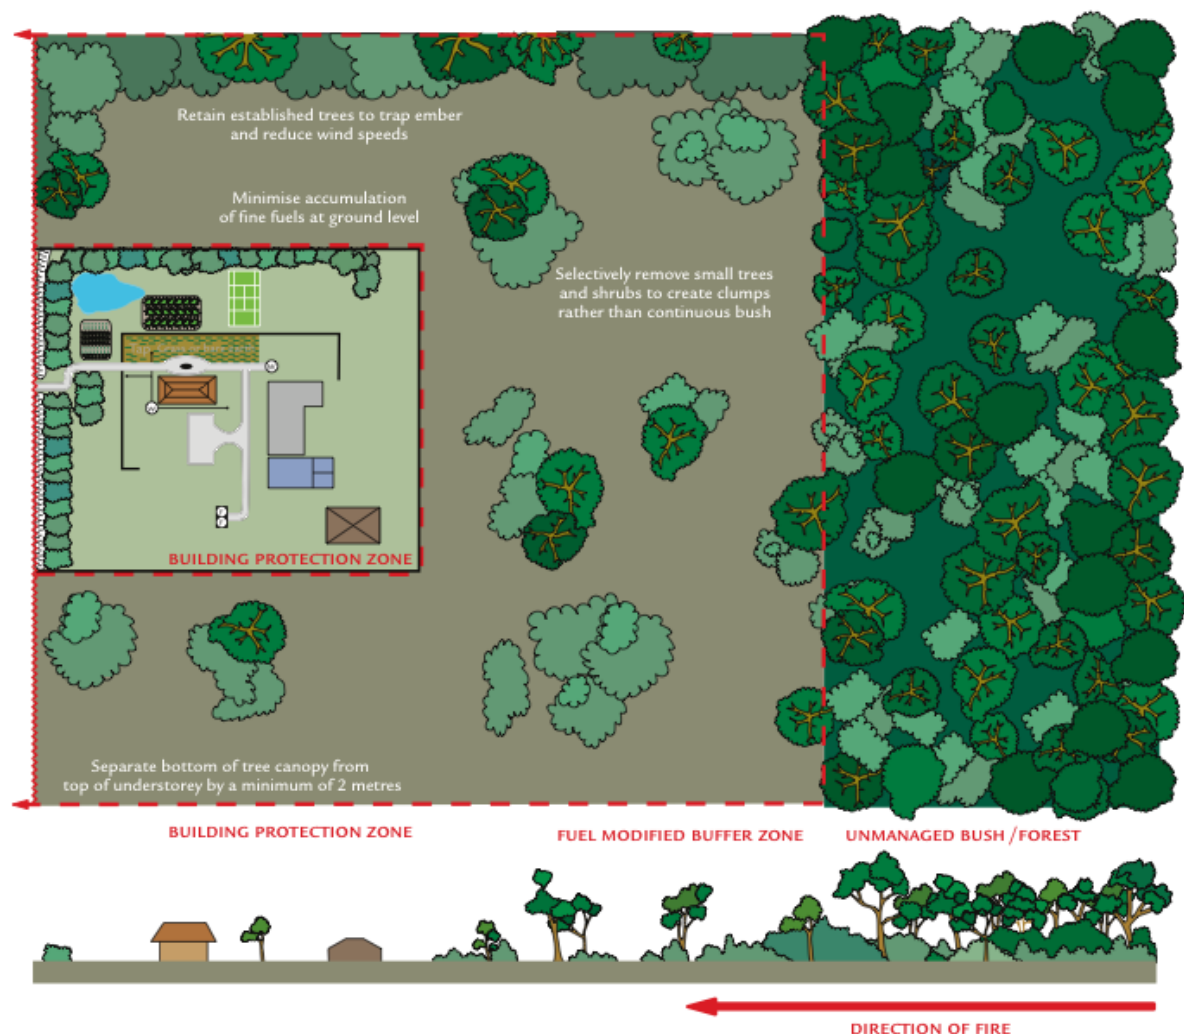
Site plan illustrating the Building Protection and Fuel Modified Zones (Source: TFS)
